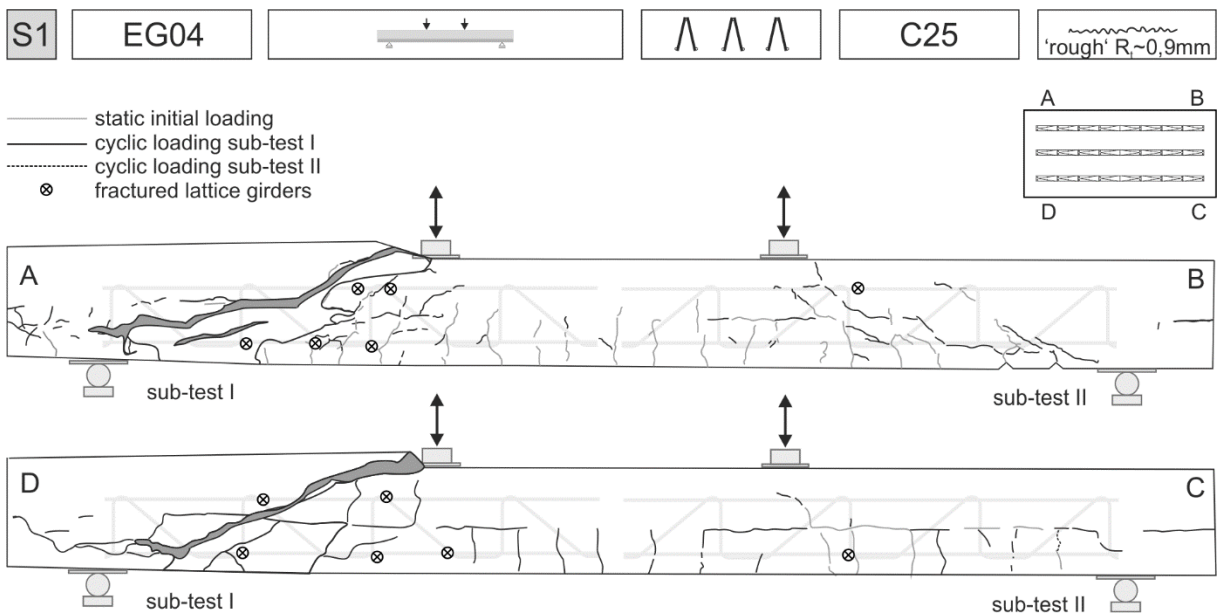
Test parameters, crack patterns and lattice girder fractures of specimen EG04
